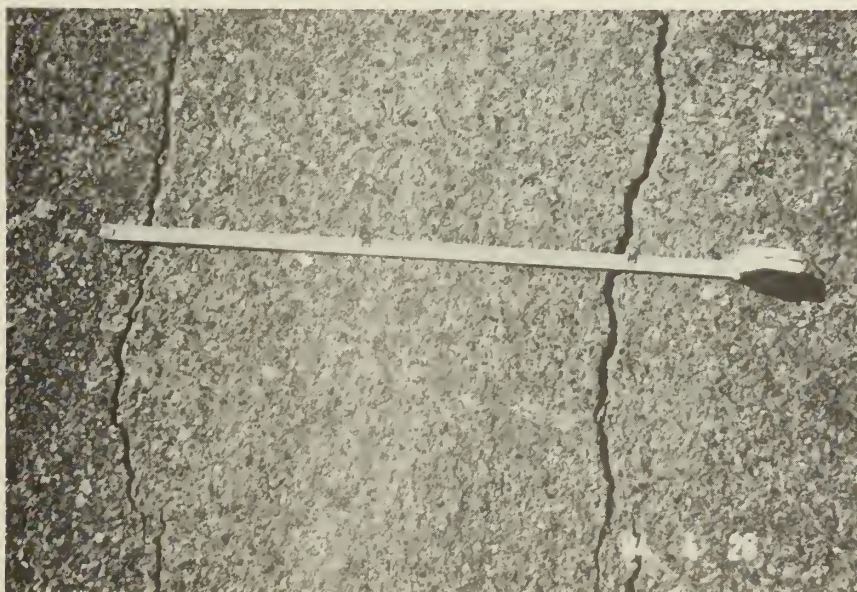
DETAIL OF PAIRED CRACK SYSTEM IN CREST PAVEMENT, ANDERSON DAM. CRACKS ARE ABOUT 21 INCHES APART AT MEASURING TAPE.
